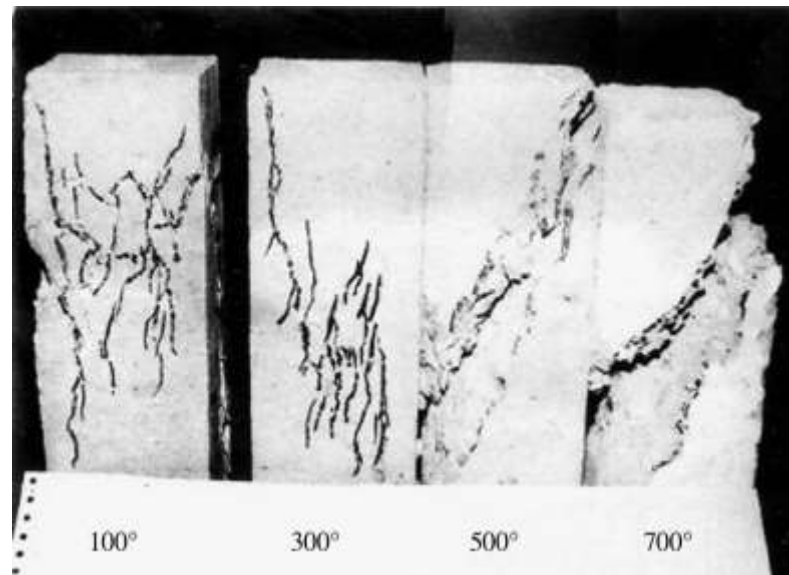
Compressive failure pattern of a prism specimen at elevated temperatures⁵⁹
